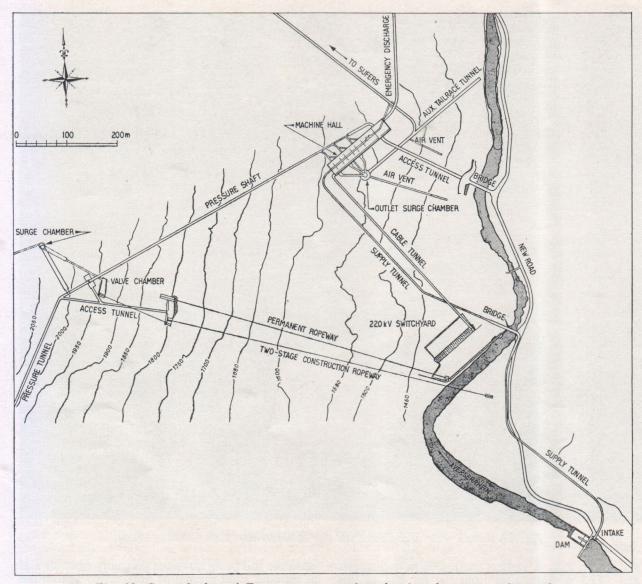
General plan of Ferrera power station showing the system of tunnels
